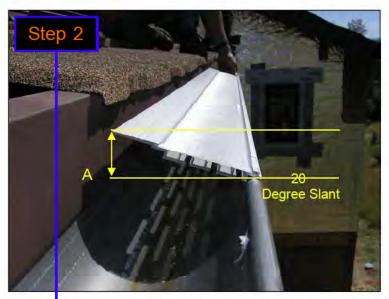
Figure A: Since there is plenty of room for a higher degree of slant to Gutterglove when installing it, we will install it at around a 20 degree angle. Plus, it is better to have a greater slant because then it will lean against the metal fascia without the need for support brackets. In a normal installation, Gutterglove would rest on top of the roof for support (under the shingles).
